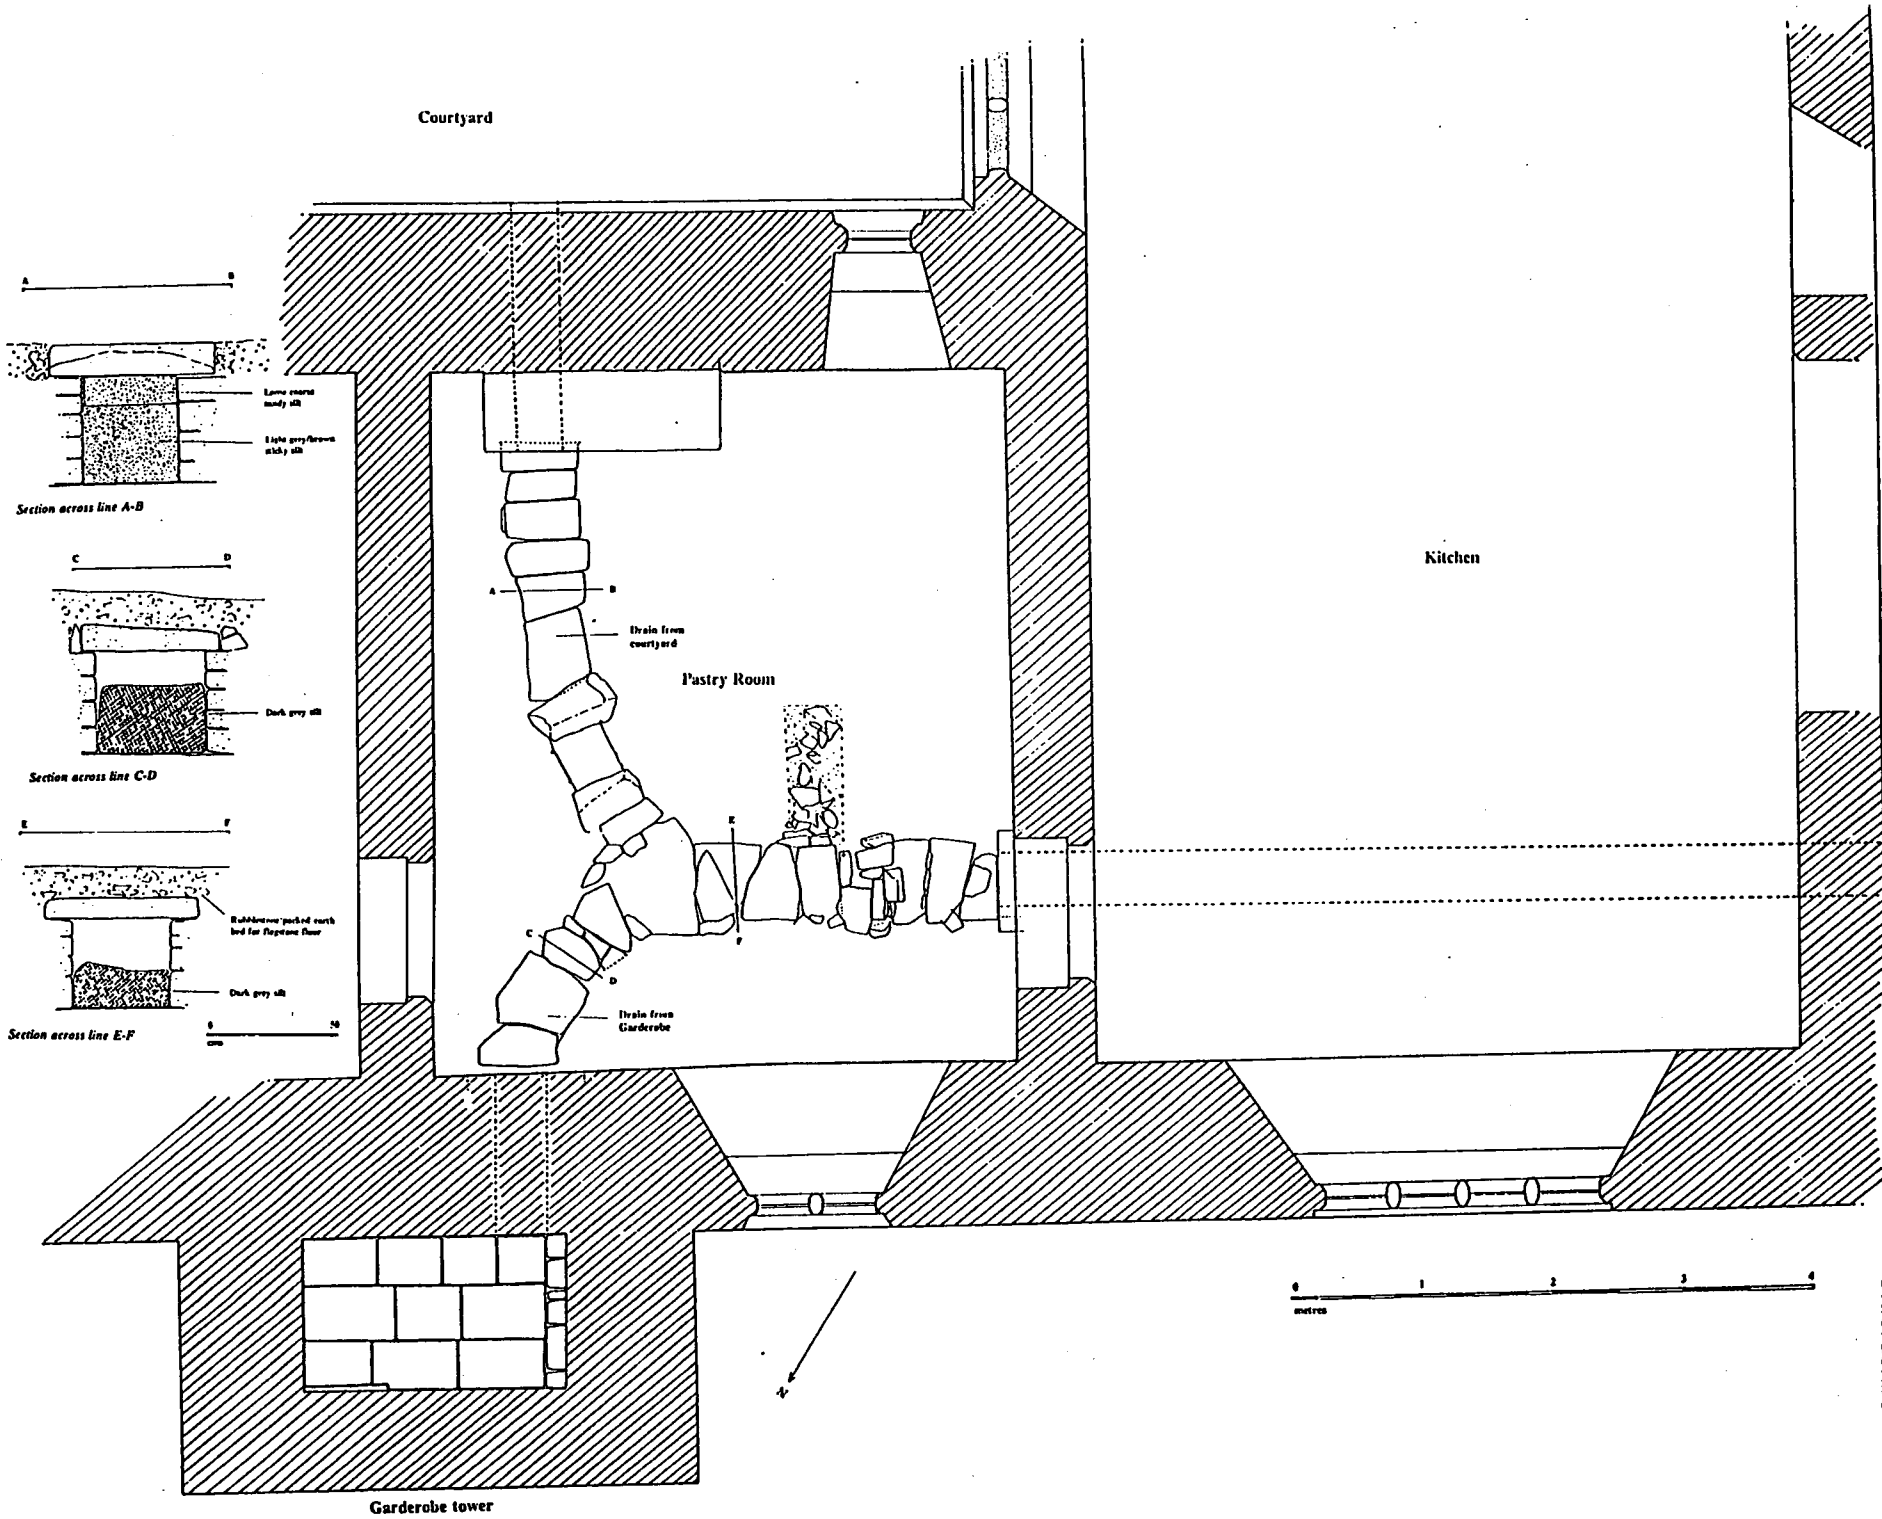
Detailed plan and sections illustrating the construction of the drains below the floor of the pastry Room at Chastleton House.
